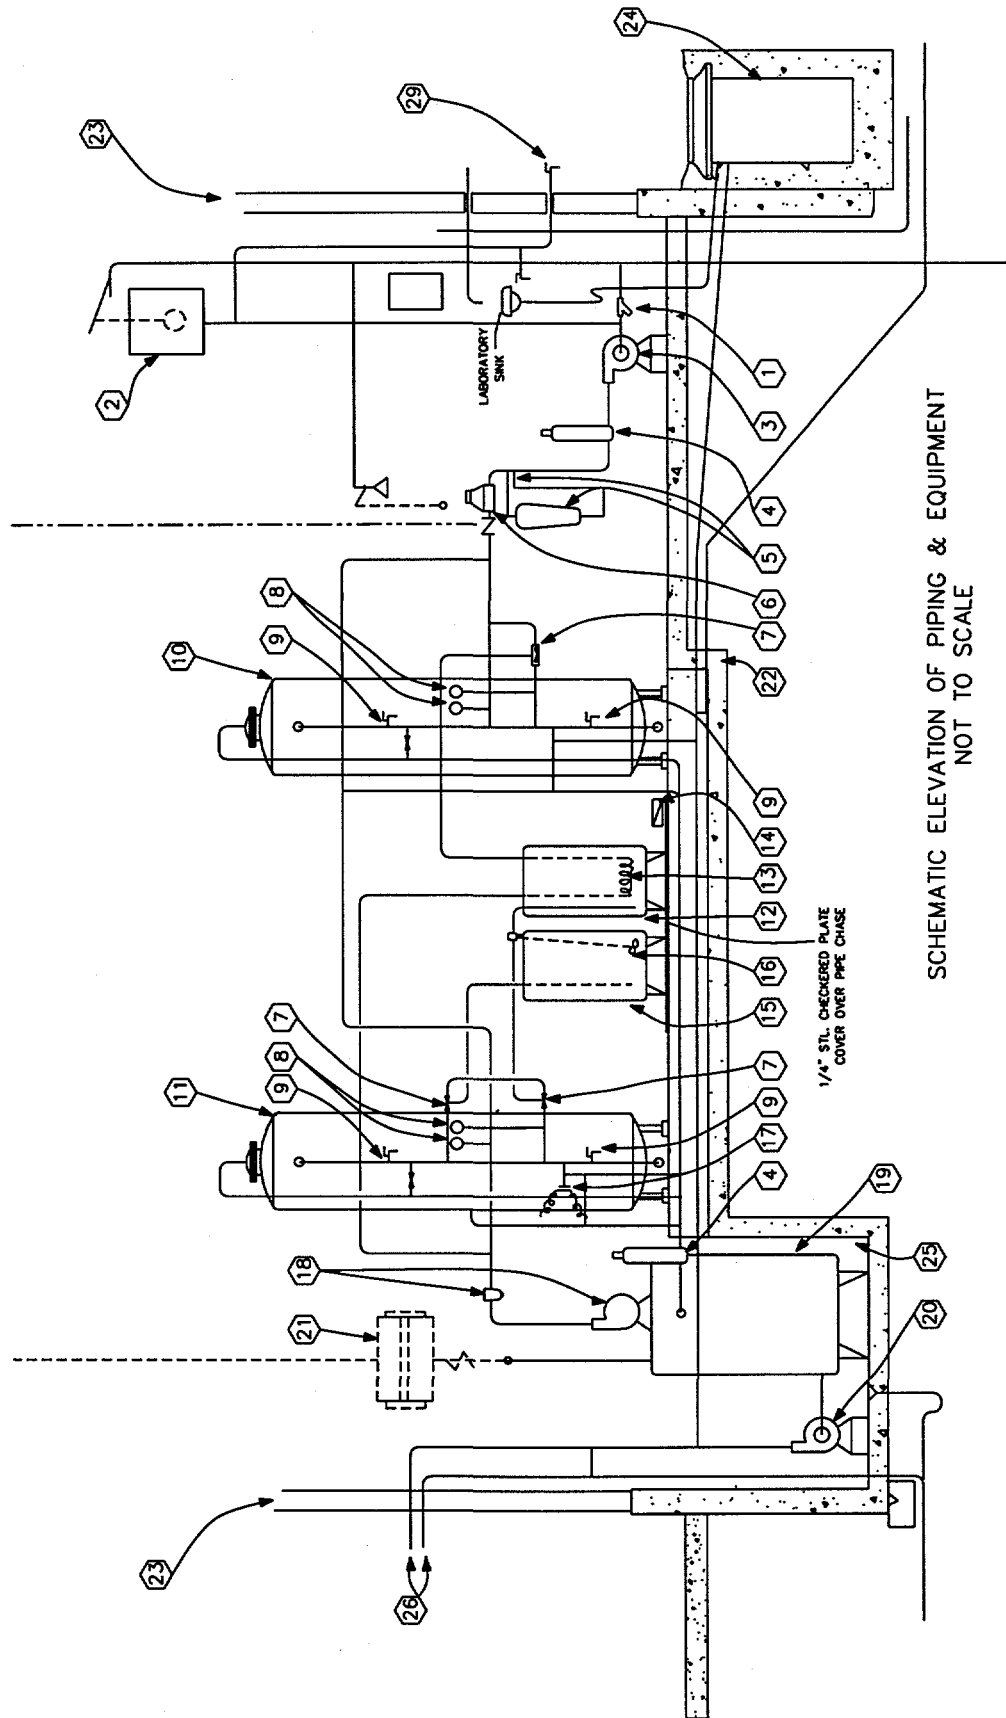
Building 579 Ion Exchange Piping & Equipment
